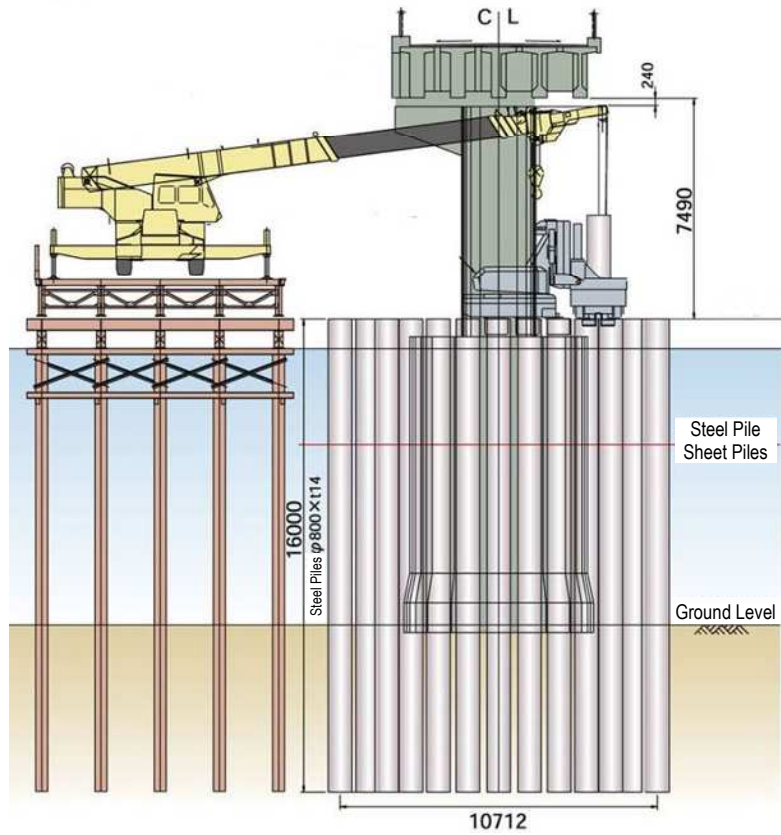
Example of Strengthening Method of Caisson Foundation
